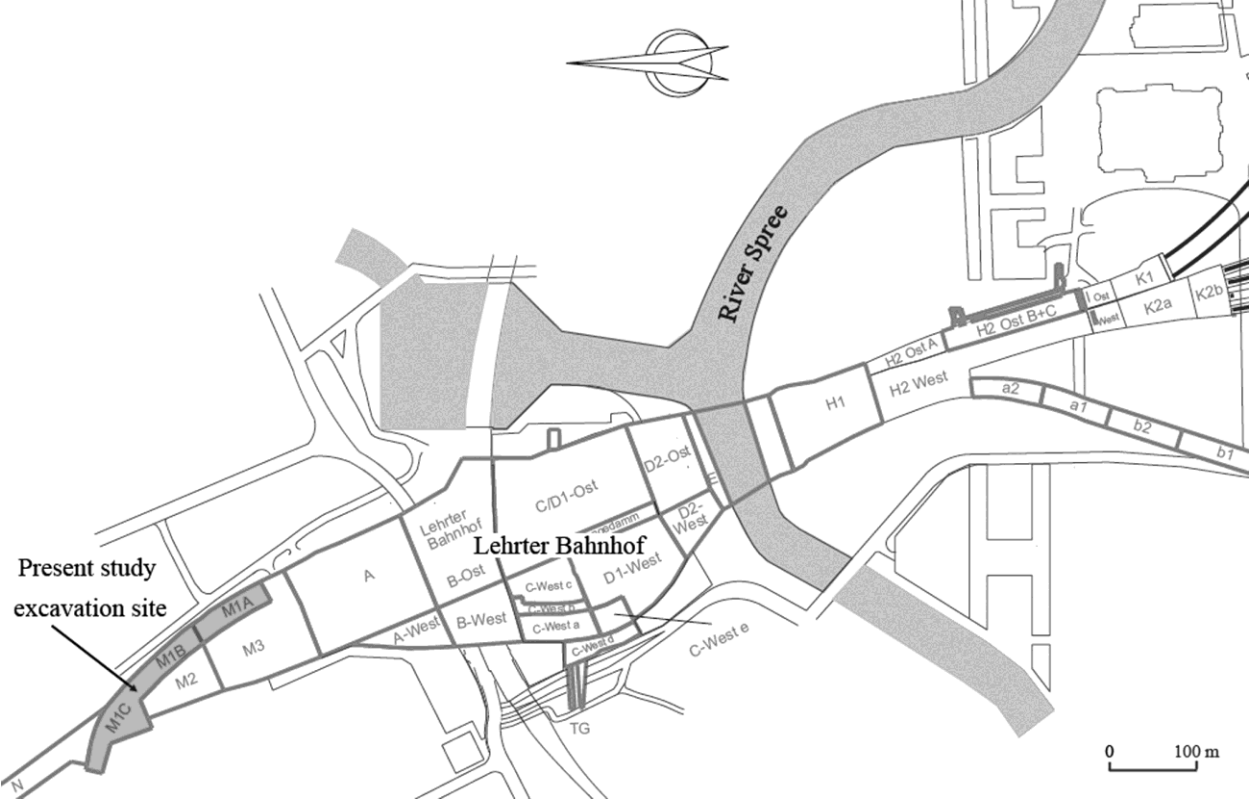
Excavation pits for the VZB project in Berlin (partial plan showing area north of Spree river)
